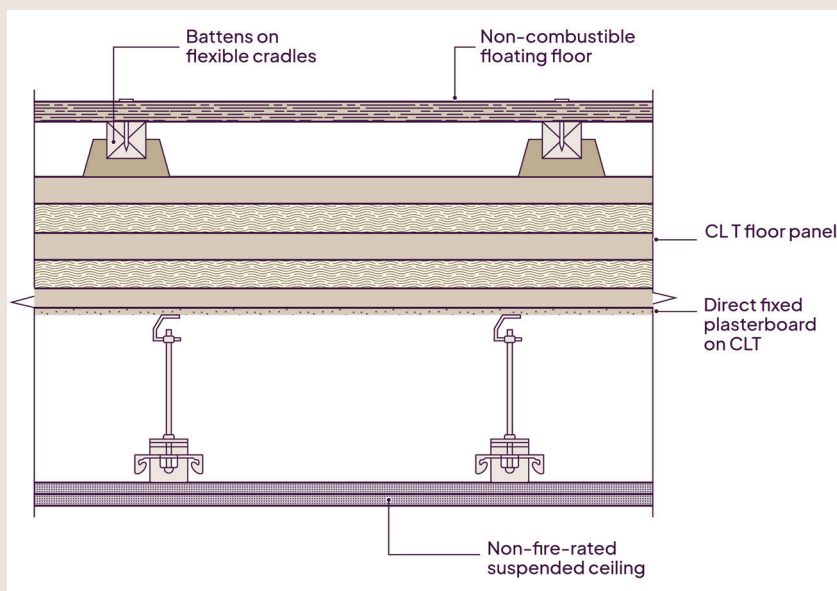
Encapsulation system for CLT floor showing topside protection using non-combustible floating floor system and underside protection using both direct fix and battened plasterboard ceiling systems
